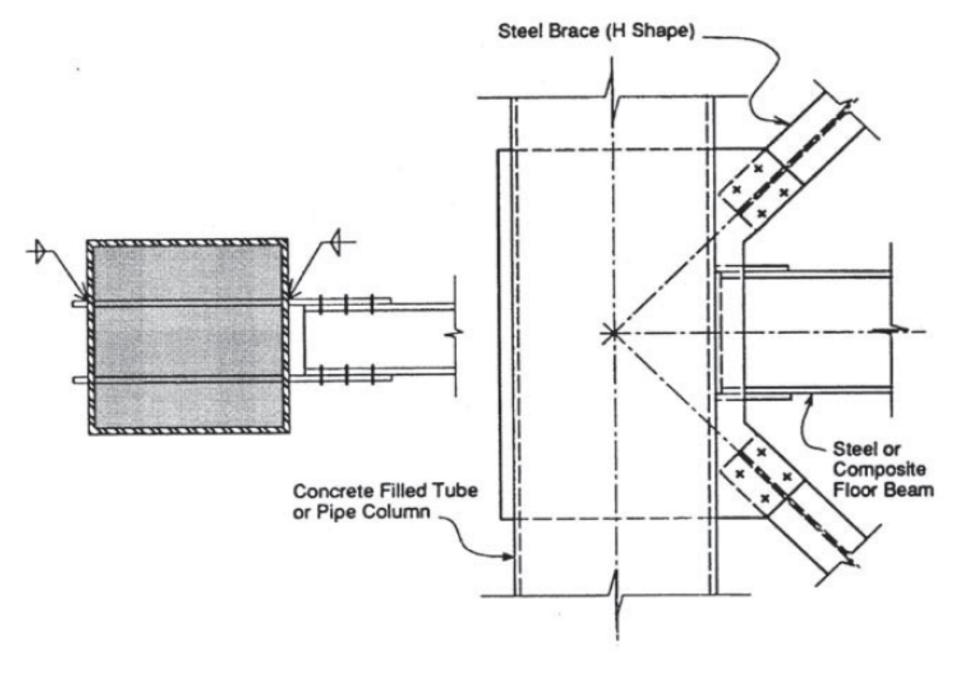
Filled HSS or pipe column-to-steel concentric base.
